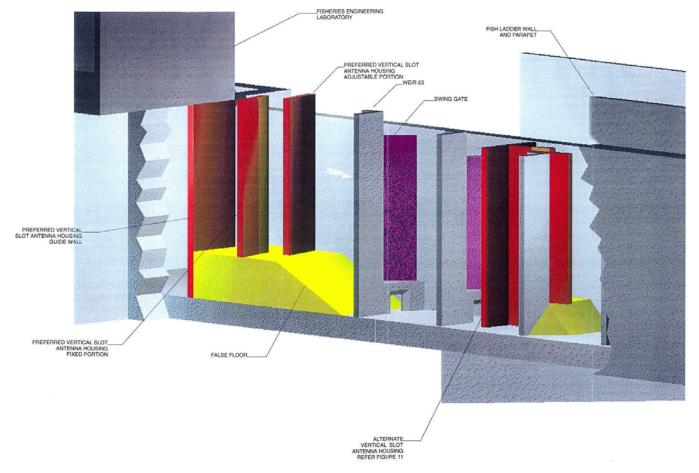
Antenna Housing Installation - Looking through Wall into Poo153 from Southeast
